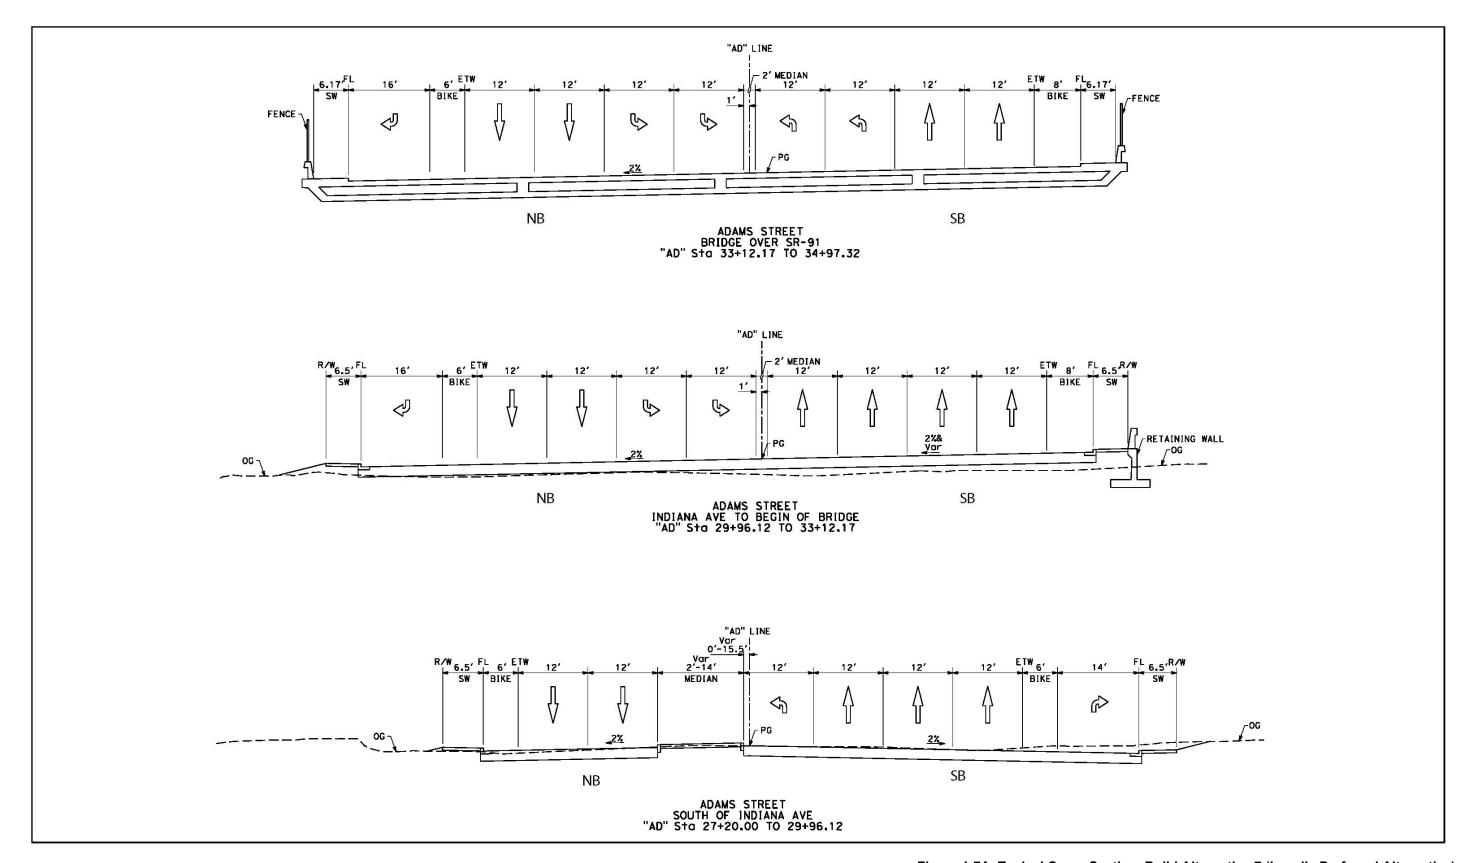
A. Typical Cross Section, Build Alternative 7 (Locally Preferred Alternative)
